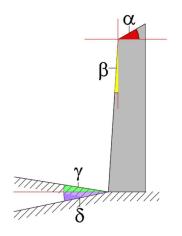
Sectional view of wall with inclination angle:  $\alpha$  inclination wall top;  $\beta$  inclination vertical wall surface;  $\gamma$  inclination ground > 0°,  $\delta$  inclination ground < 0° (drawing: S. Caregnato).
